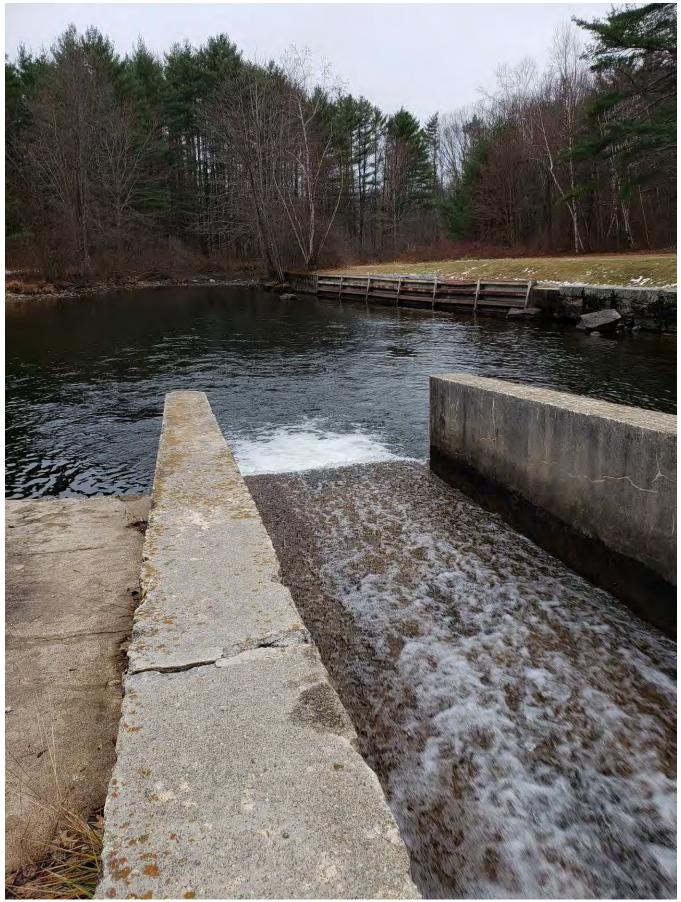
SLUICEWAY CHANNEL DOWNSTREAM OF GATE.
